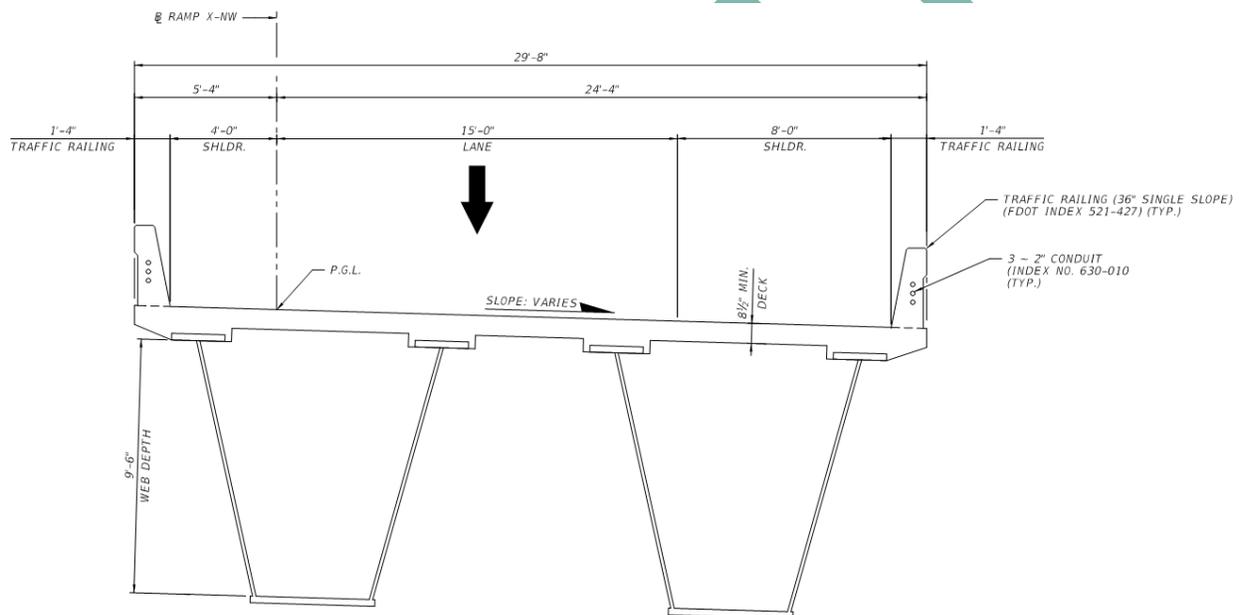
Bridge Typical Section (Bridge No. 1)
